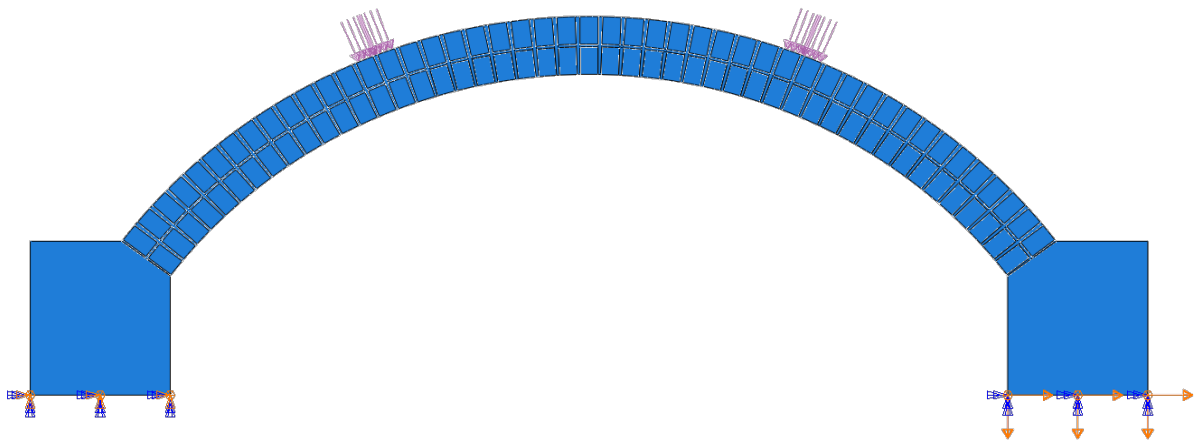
Masonry arch model without steel plates of foundation movements of 10mm horizontally and 5mm vertically.
